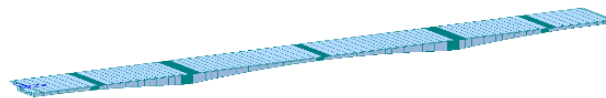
Finite element model of continuous variable cross-section box girder with three spans
